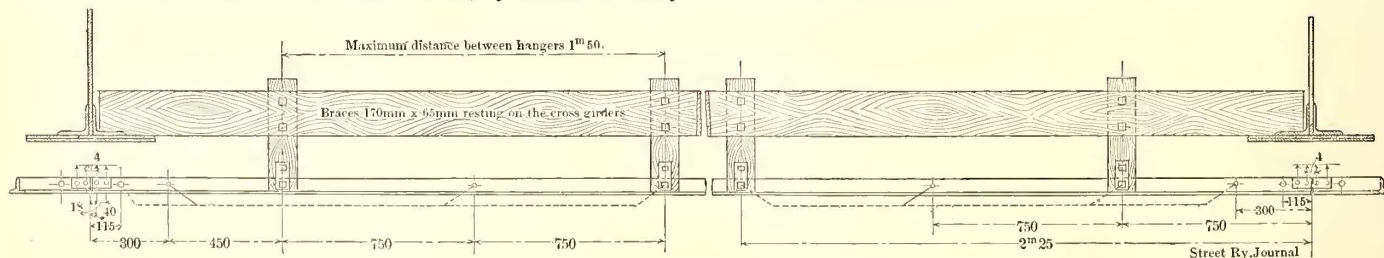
OVERHEAD CONSTRUCTION USED IN CAR HOUSES AND SWITCH YARDS
